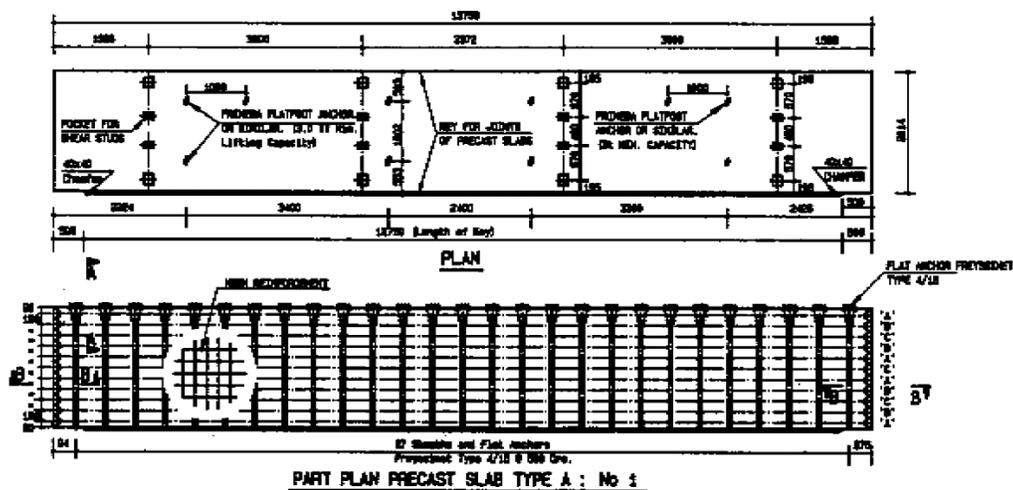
Plan View of the Slab Planks (pockets for stud connectors & PT cables)
